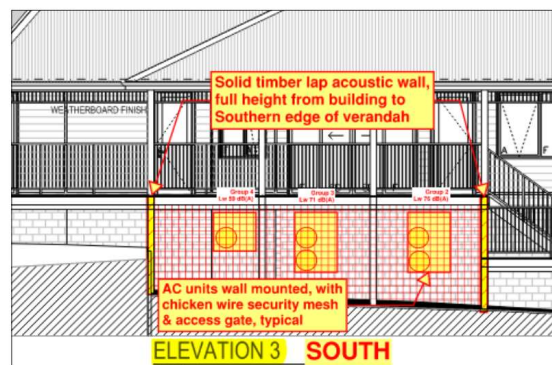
AIR CONDITIONING – GENERAL ARRANGEMENT SOUTH
